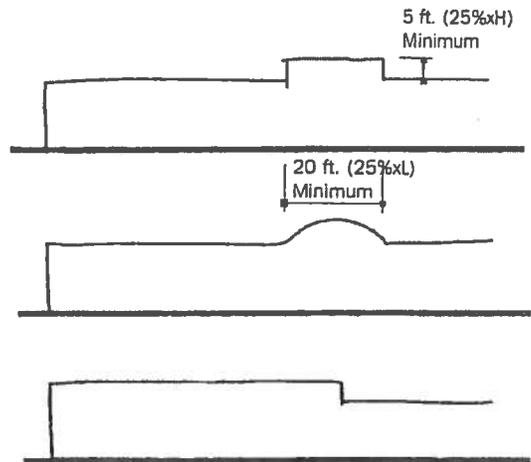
INDUSTRIAL BUILDING ARTICULATION EXAMPLE
